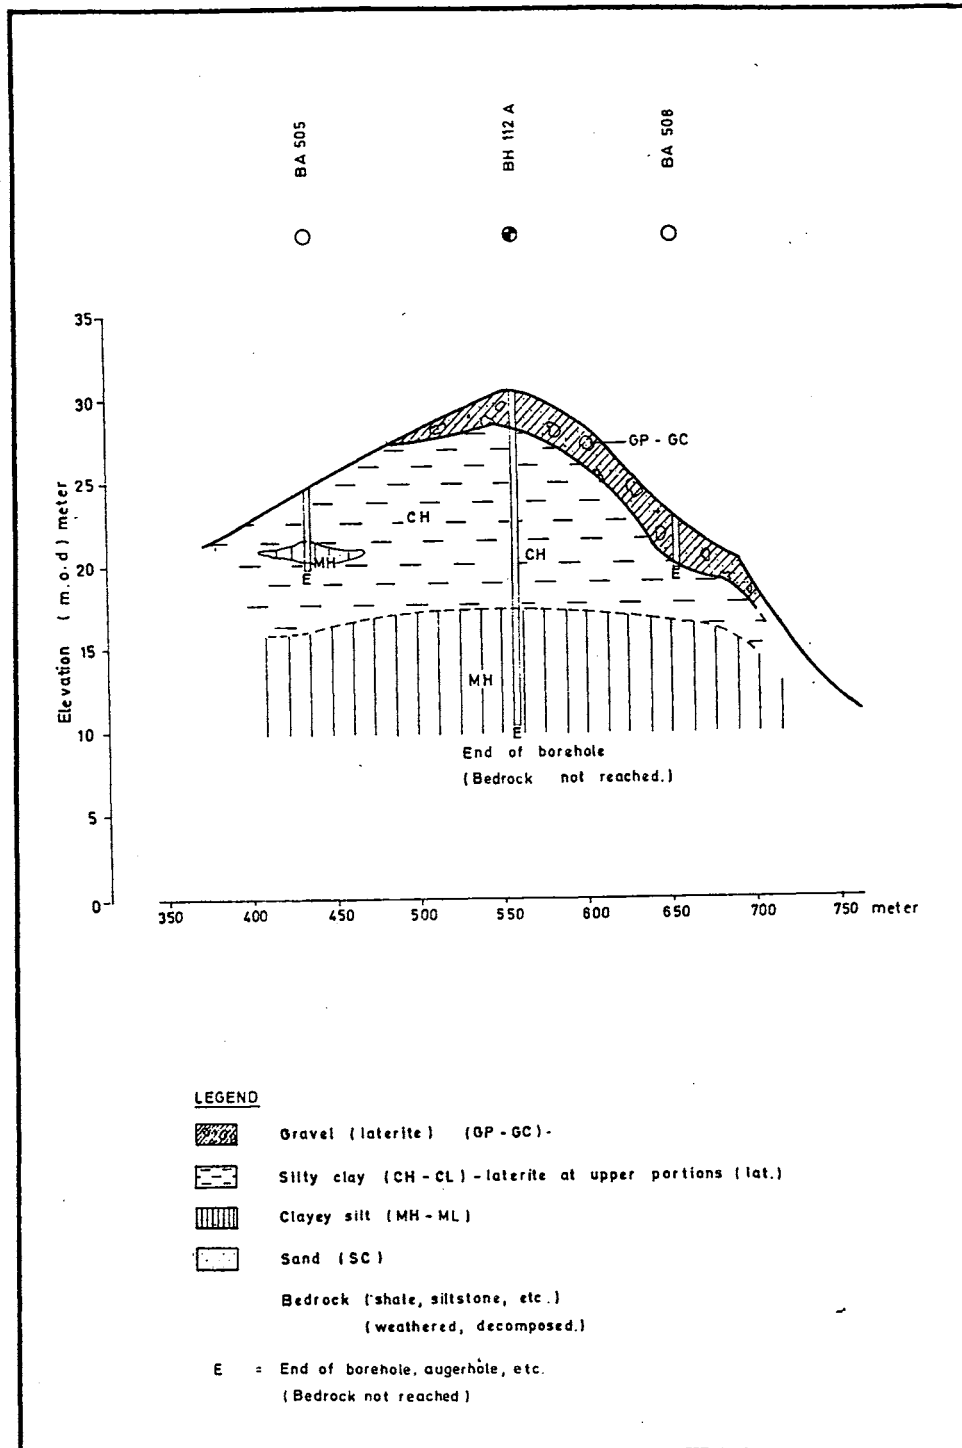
Typical cross-sectional profile of borrow area at Sungai Bekok Dam site.
